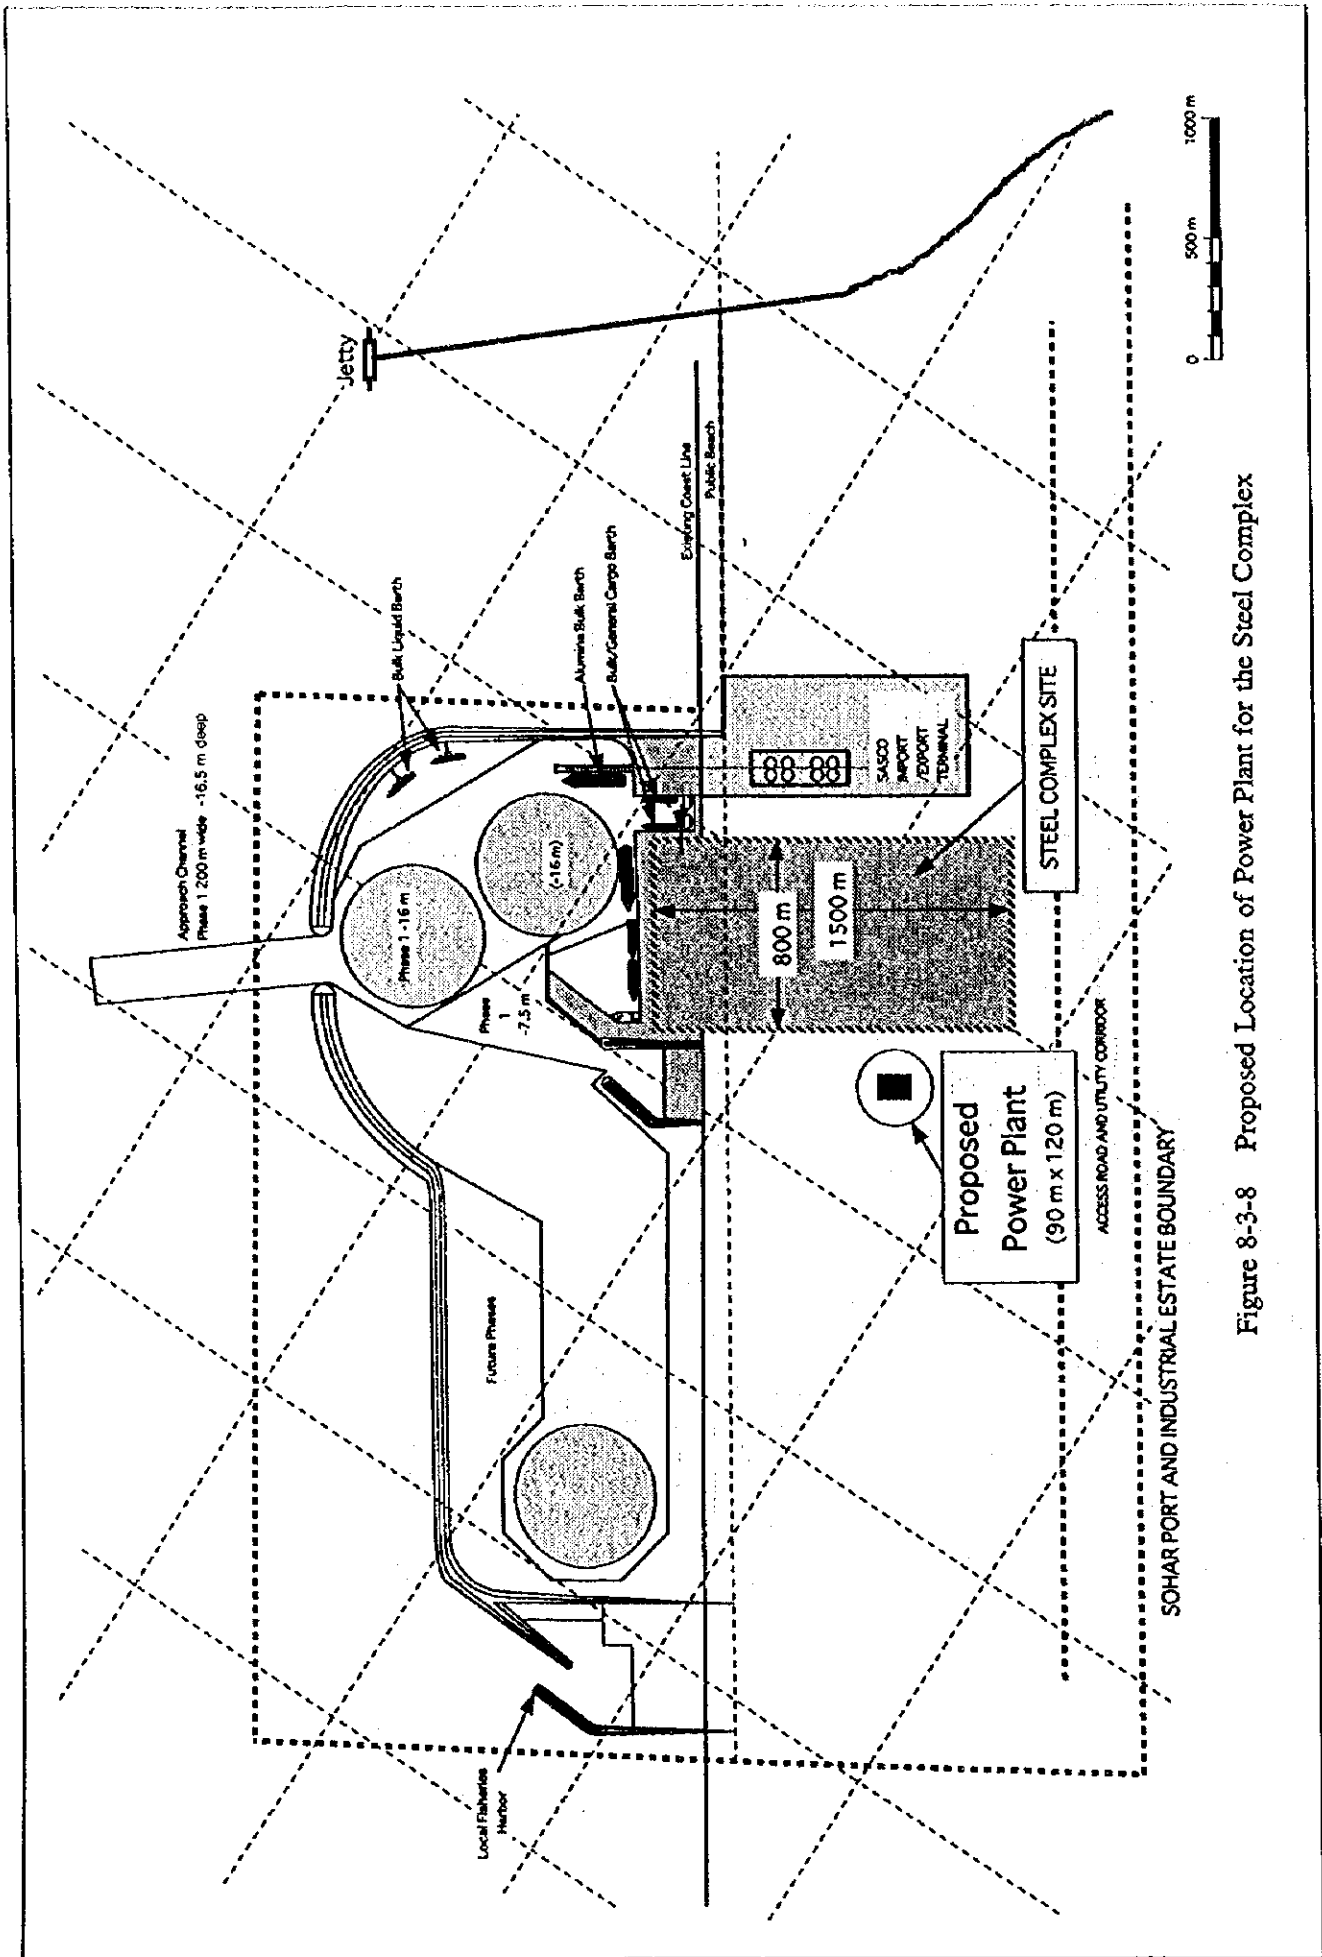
Proposed Location of Power Plant for the Steel Complex
